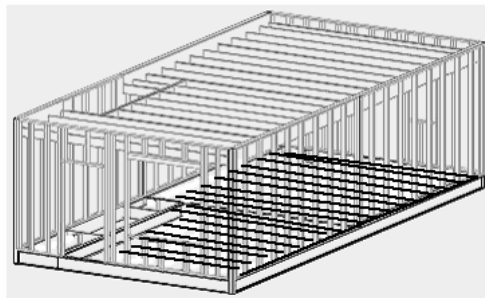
Typical framing of structural steel chassis (13'9" w x 42' l x 10'10" h), shown with light gauge steel exterior wall and ceiling subassemblies installed
